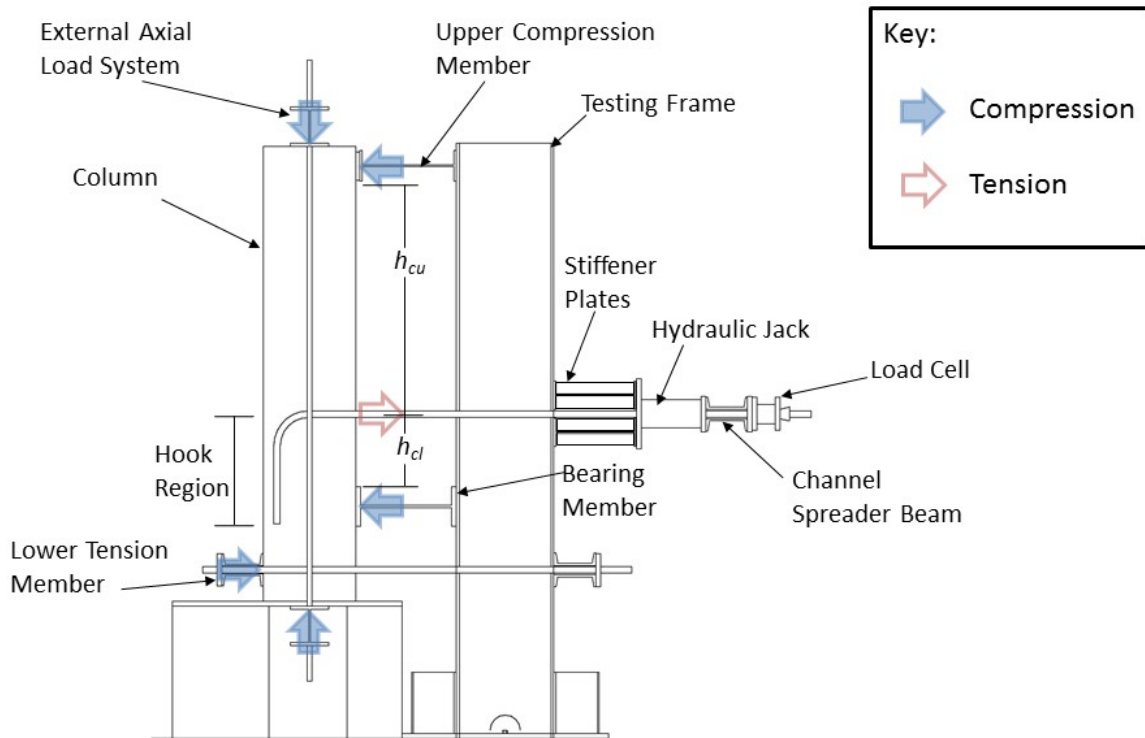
and b show the loading system used in this study, which is a modified version of the test frame used by Marques and Jirsa (1975). The system simulates the forces applied at an exterior beam-column joint by applying tensile loads to the hooked bars. The beam compression reaction is provided by the bearing member. The upper compression member prevents the column from overturning and is placed so as to not interfere with the failure region.
